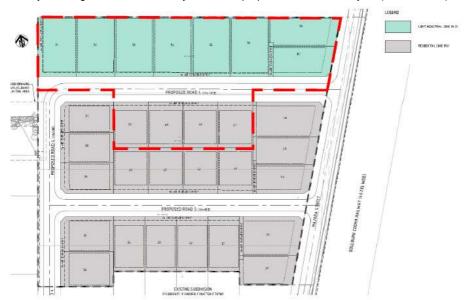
Majara St, Bungendore, Lots 3-4 Proposed Subdivision Layout
